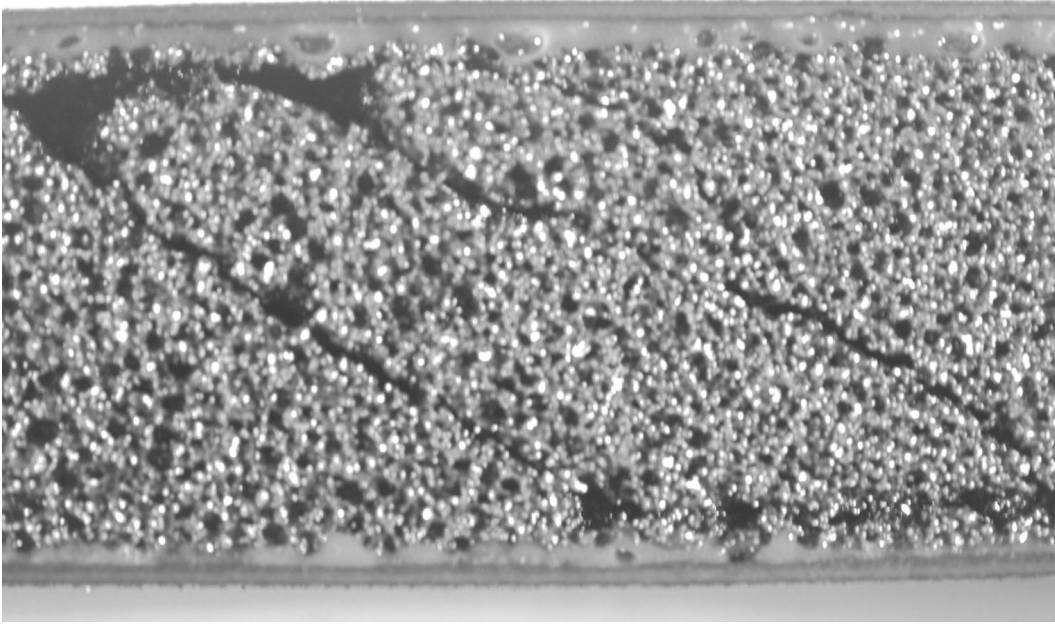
Sandwich Beam Failure (5×) (Specimen 6)
